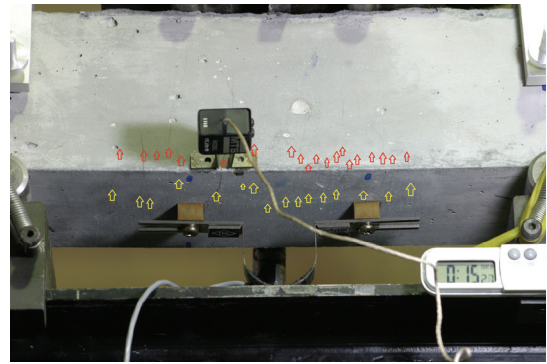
Typical crack patterns after crack localization for PVA20 specimen
